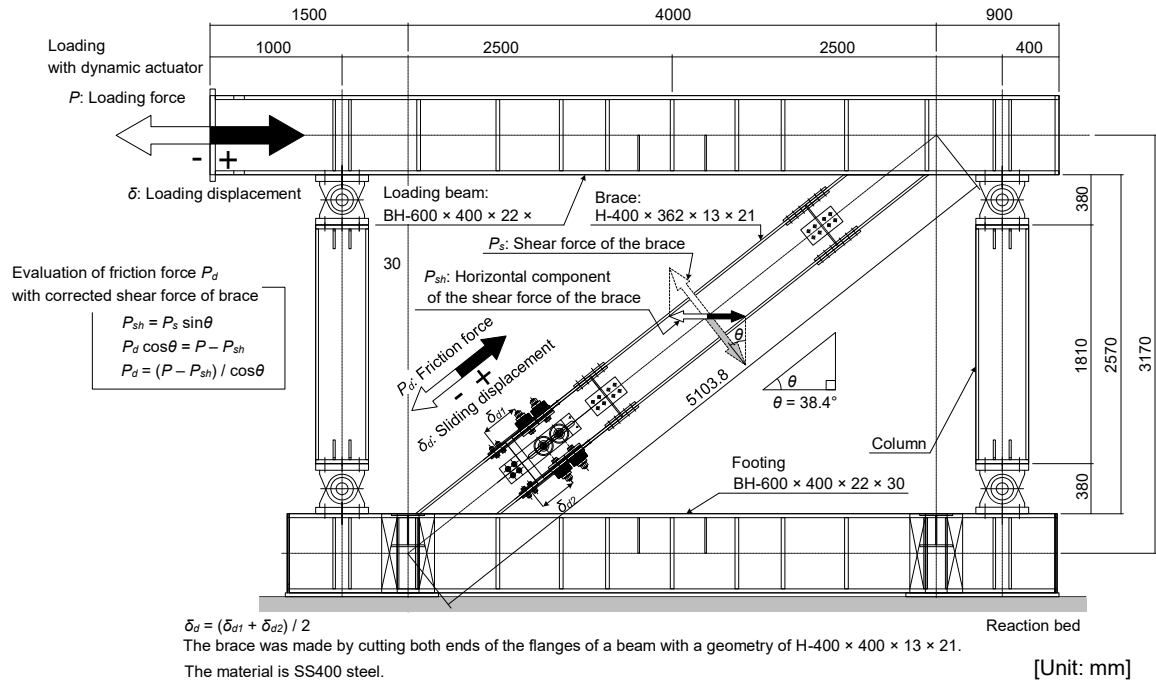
Steel beam-column loading frame incorporating a brace-type multi-unit friction damper in full-scale tests¹⁾
